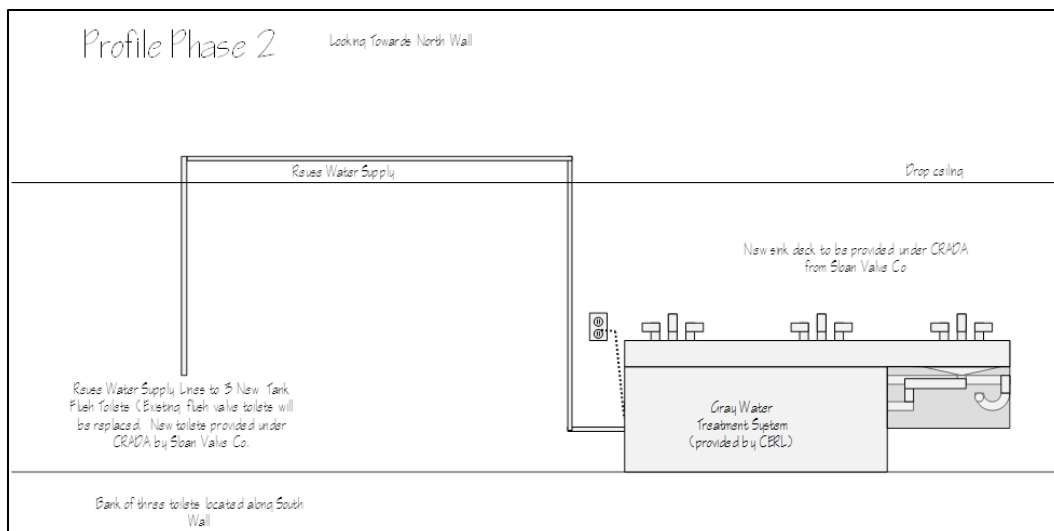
Schematic of existing North wall of men's bathroom in Bldg. 3.
